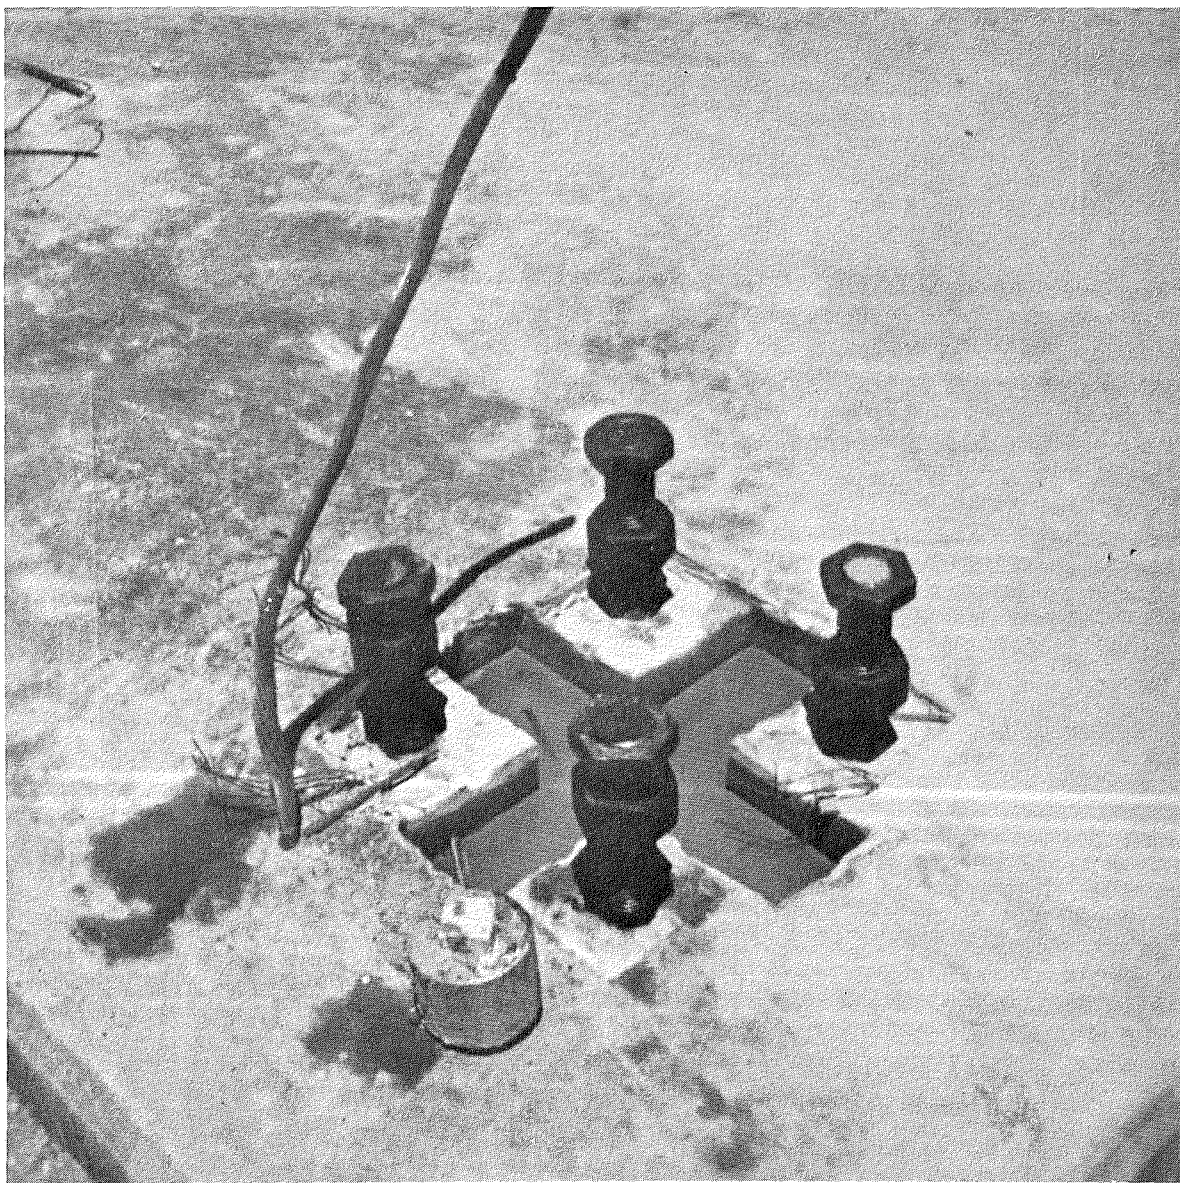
Tower Leg Mount on Completed Foundation
